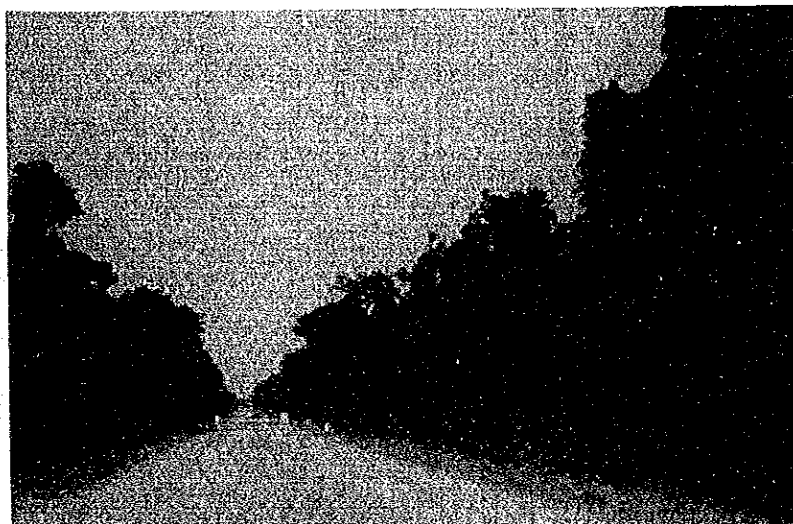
Sub-tropical jungle. Road is the Janakpur Mahendra Highway
